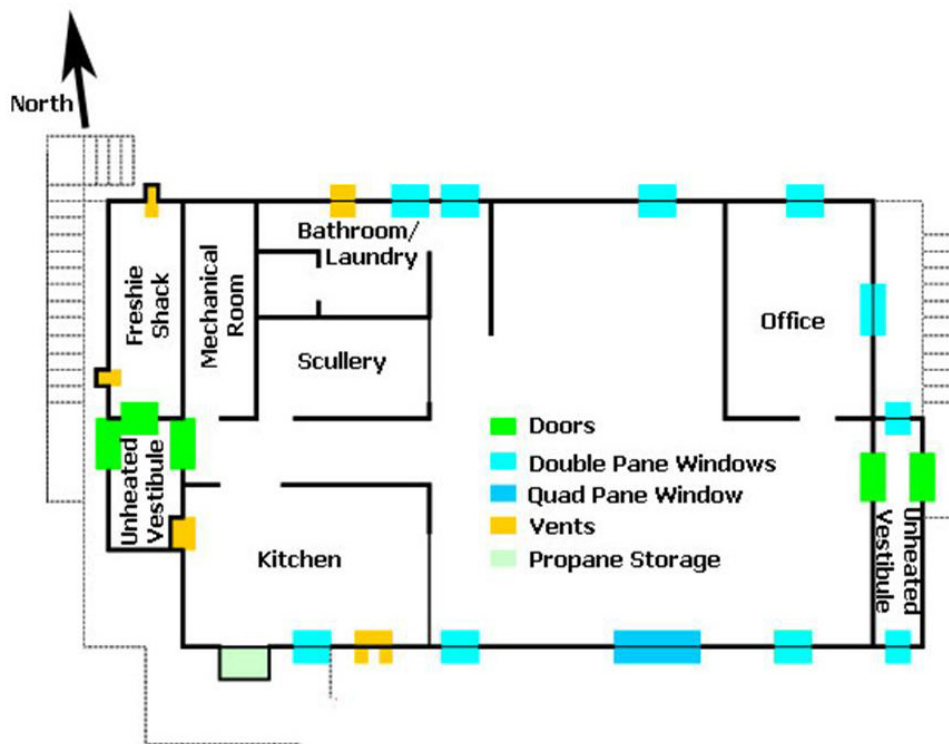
Plan view of Big House at Summit Station, Greenland.
